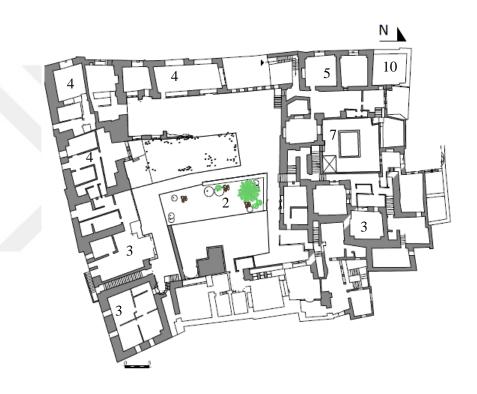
Second floor plan of Abdelhadi Palace in Nablus old city (Kanaan, 2010)
